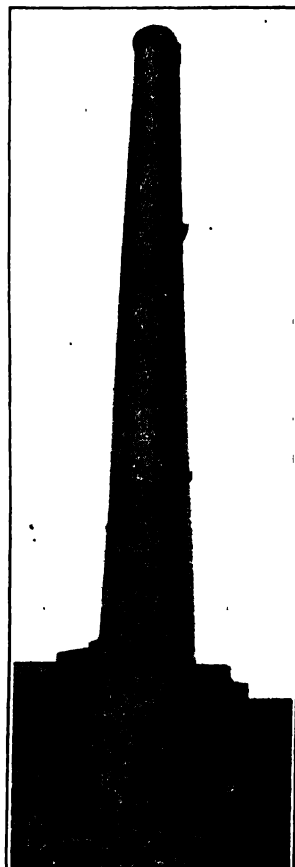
Weiderholt reinforced concrete and hollow clay tile chimney.
